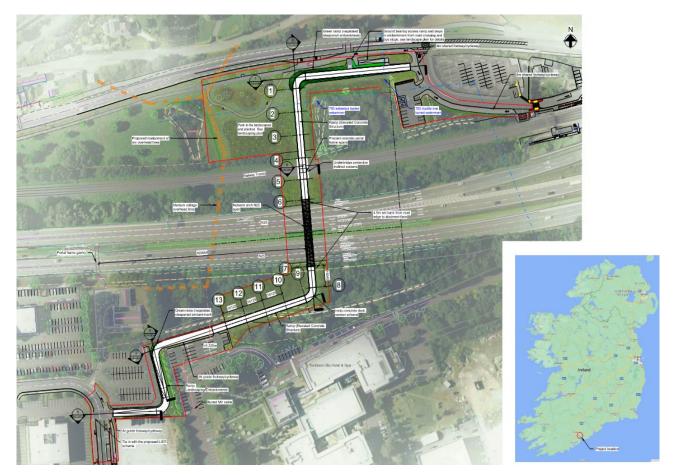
Site layout map. Not to scale. Extract from site layout plan drawing – refer to Drawing No. LIPB-ARUP-ZZ-XX-DR-CB-0003 in Volume 3 of this EIAR.
